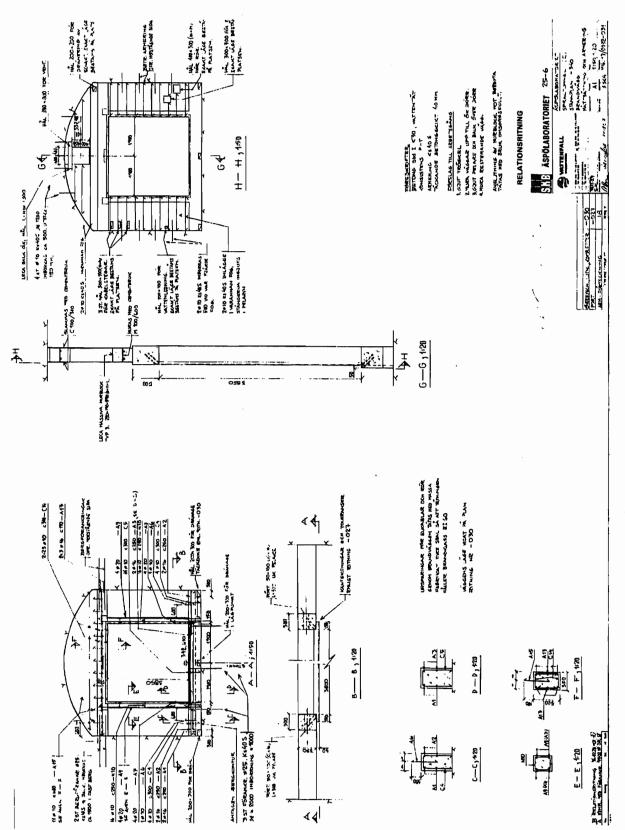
The fire proof wall at the lift's landing area at level –340 m.
